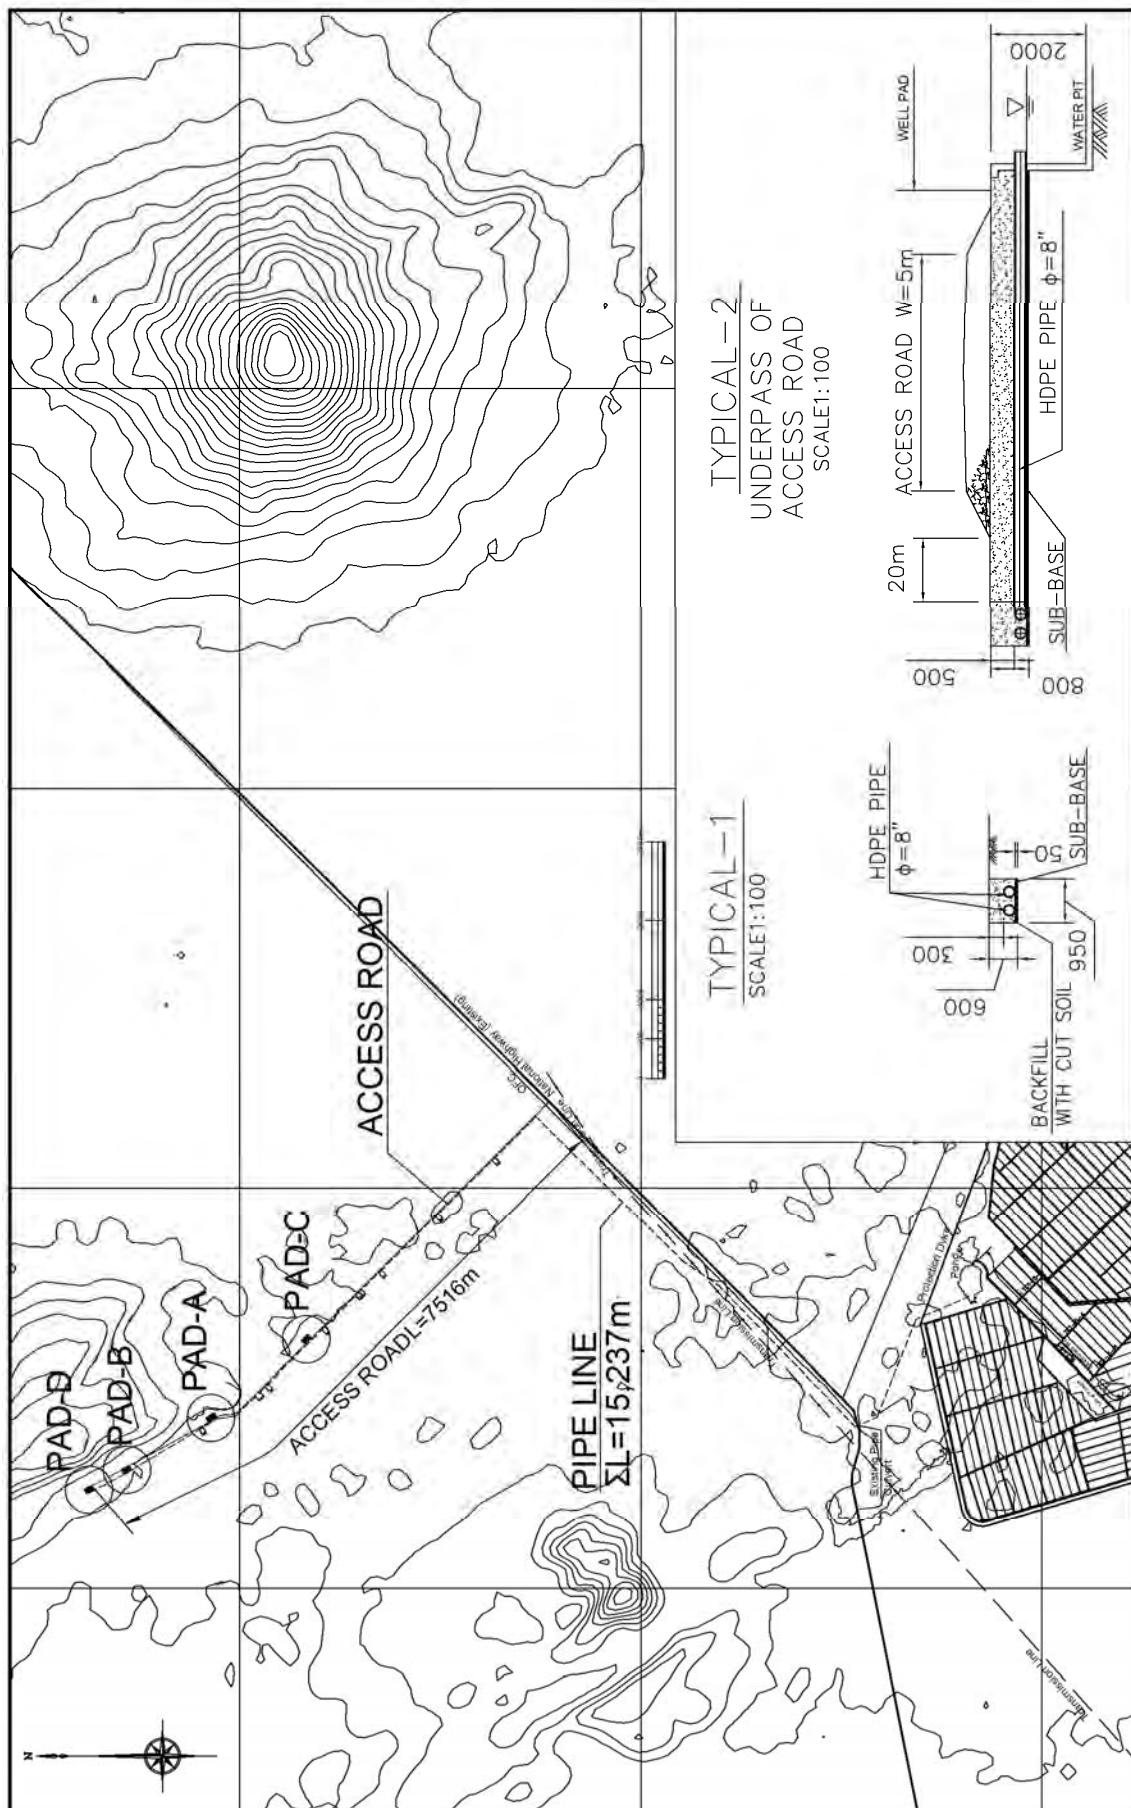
General Layout and Typical Cross-section of the Water Supply System
